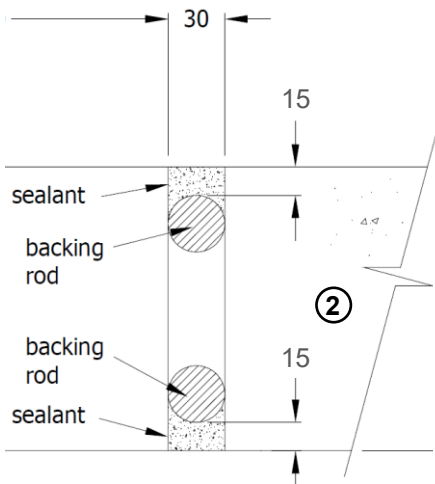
Wall linear gap system H – Assessment 1 (As shown in WF 187564) - dimensions in mm
